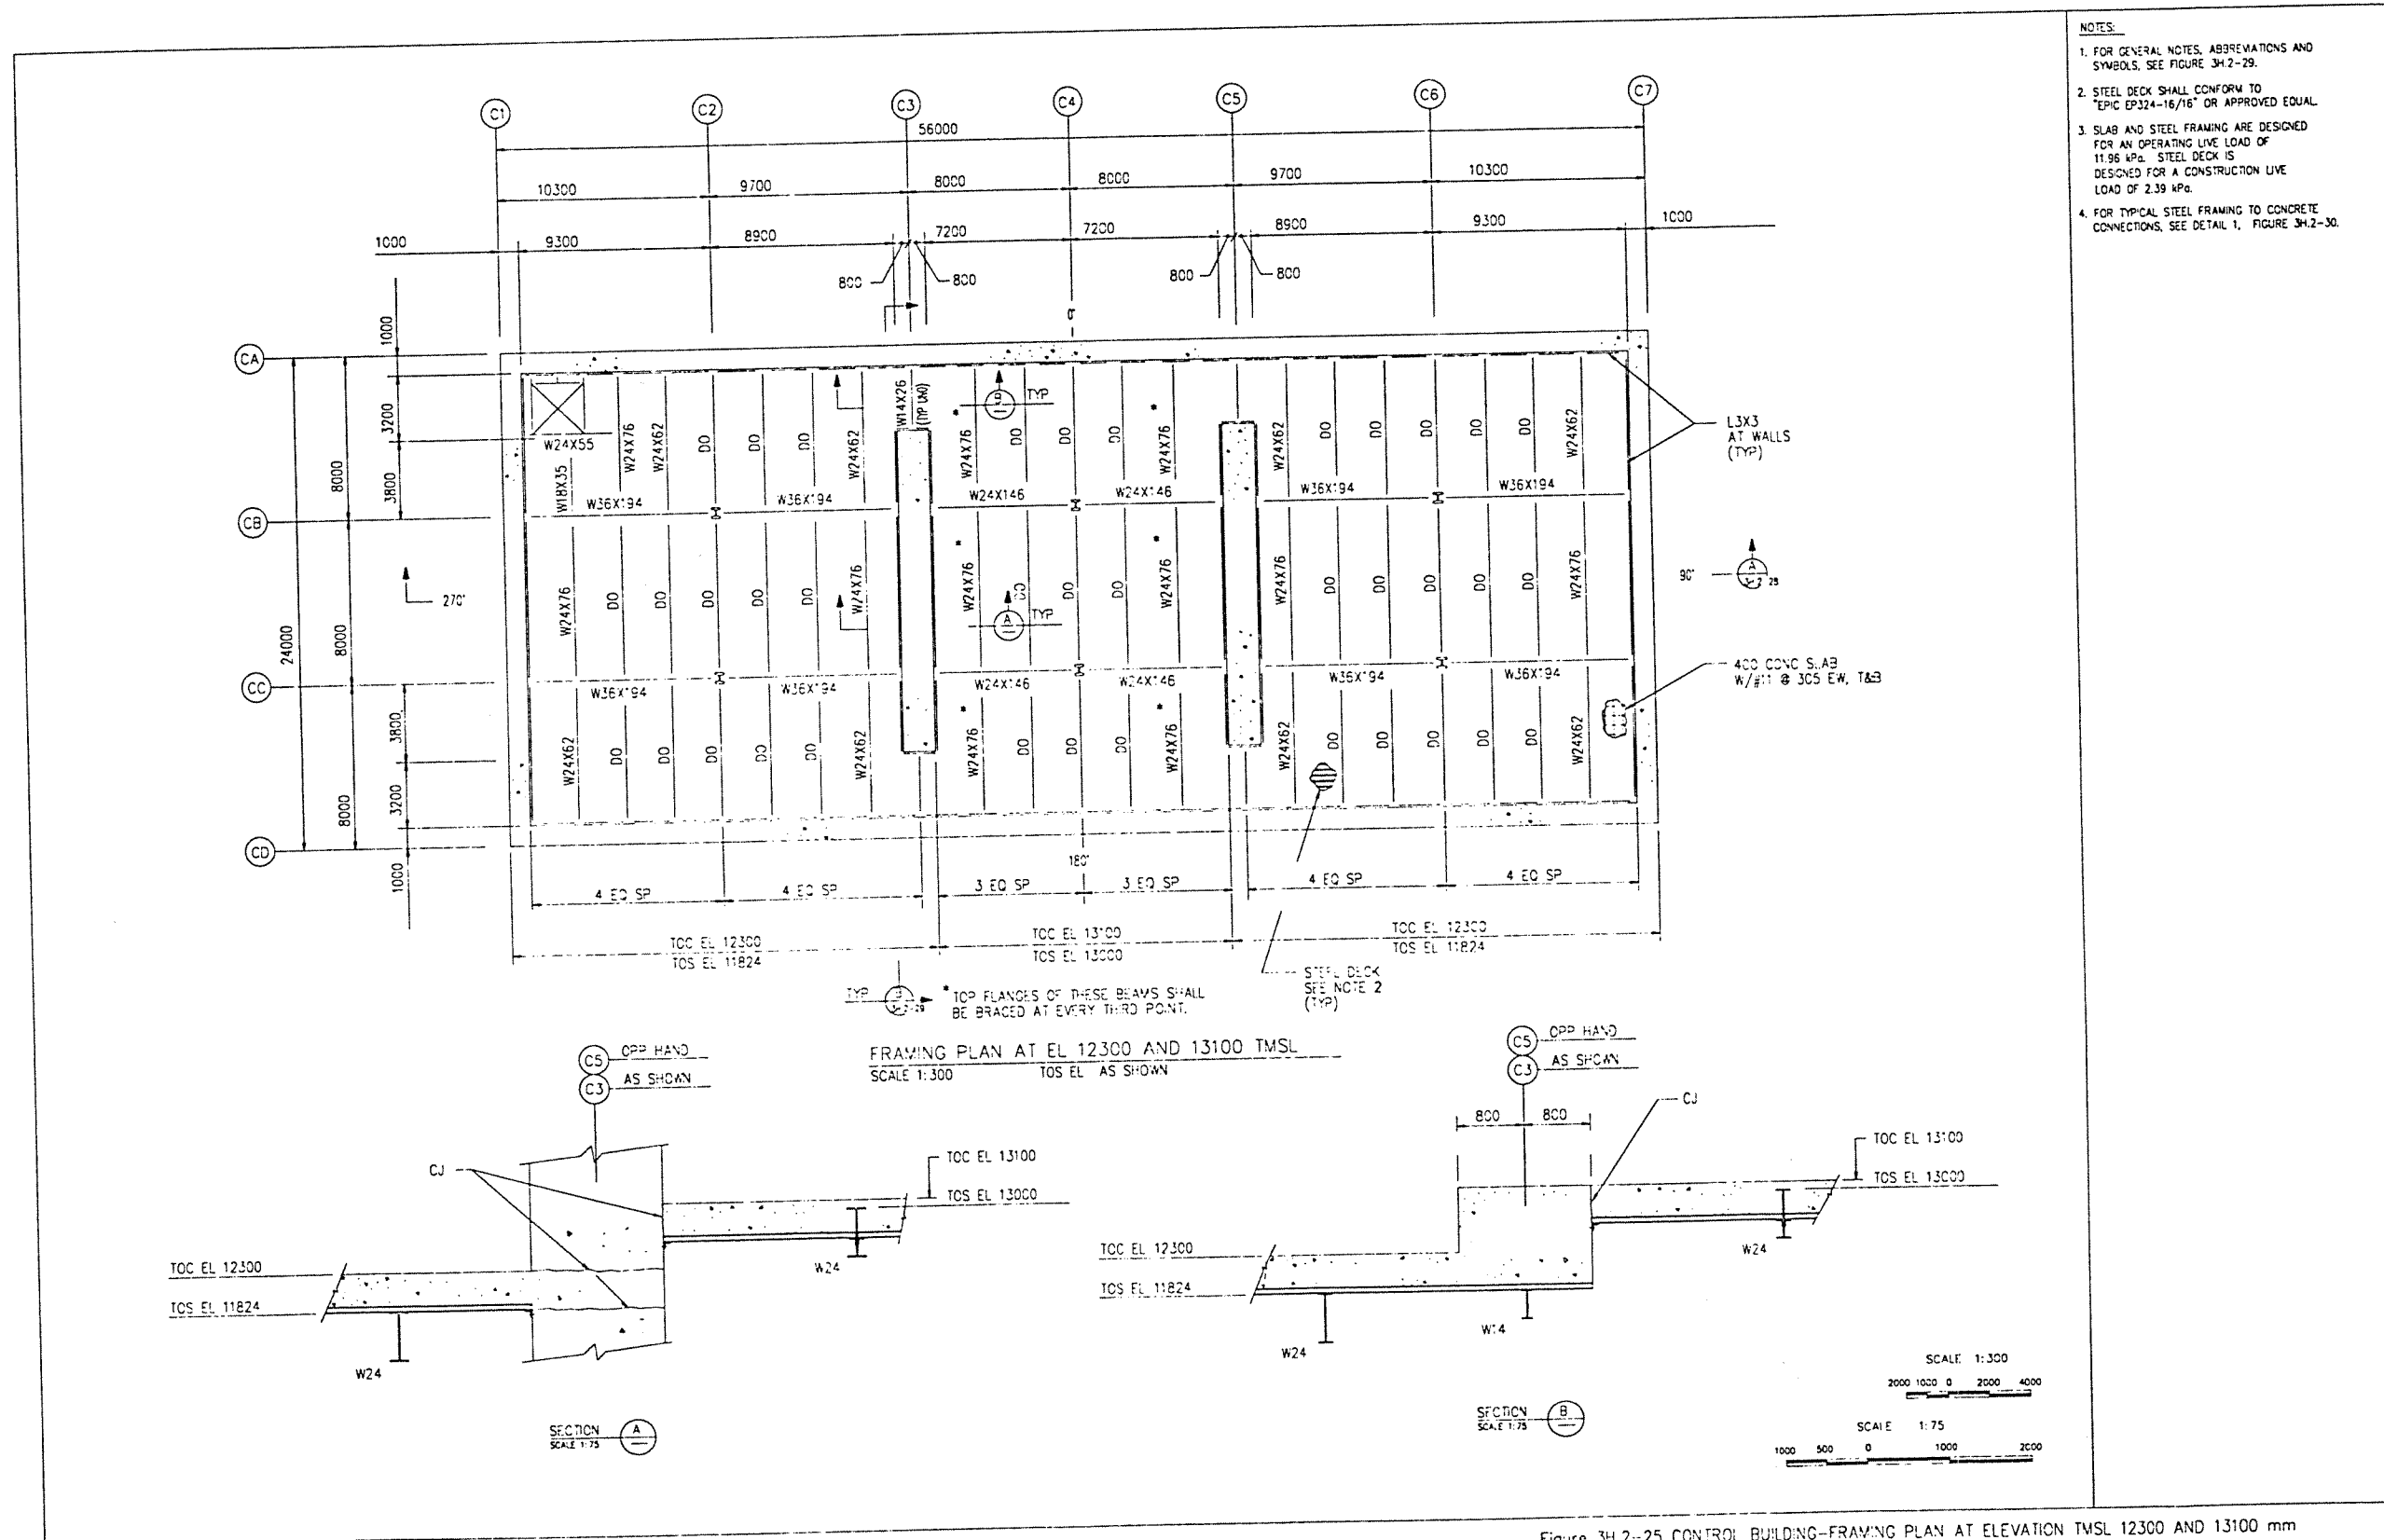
CONTROL BUILDING—FRAMING PLAN AT ELEVATION TMSL 12300 AND 13100 mm
